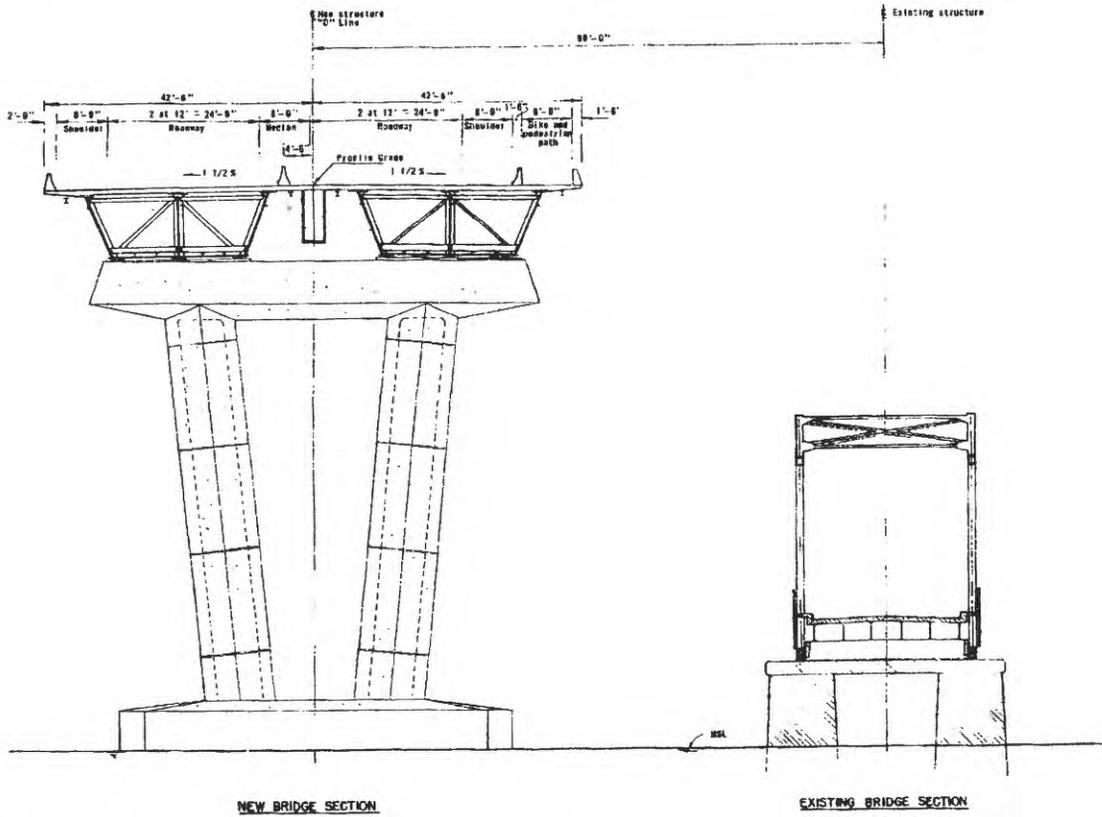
Typical Section for main span of Dumbarton Bridge.
